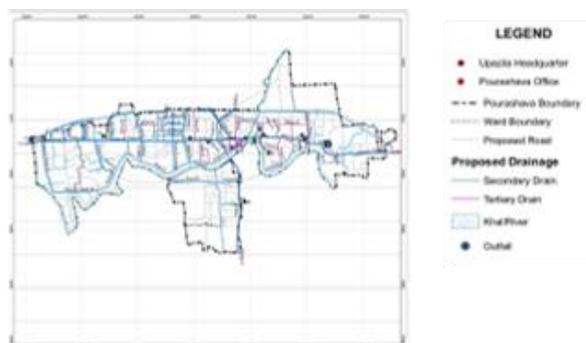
Drainage Network Plan in Hajiganj Pourashava
